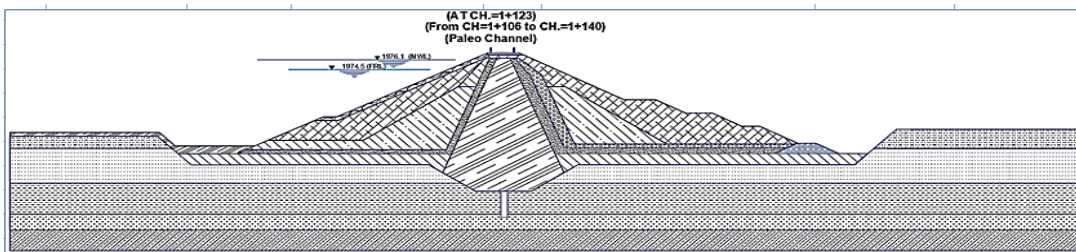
44 Final Drawing for Measurement for pricing for BH-8
